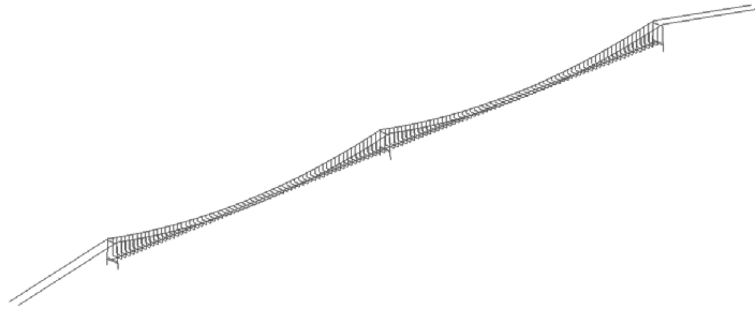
3D finite element model of the case bridge with a concrete longitudinal I-shaped center tower
